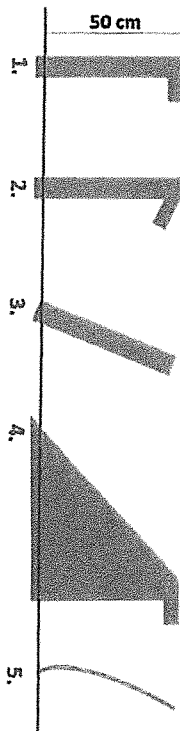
Profiles of barrier design options for the control of W/L/T movements: (1) Straight wall with horizontal lip on right side, to deter access to the left area. (2) Straight wall with angled lip on right side, to deter access to the left area. (3) Wall angled to right, to deter access to the left area. (4) Straight wall with ramp on right and horizontal lip on right side, to deter access to the left area and allow access to the right area. (5) Fence structure curved to the right, to deter access to the left area.
